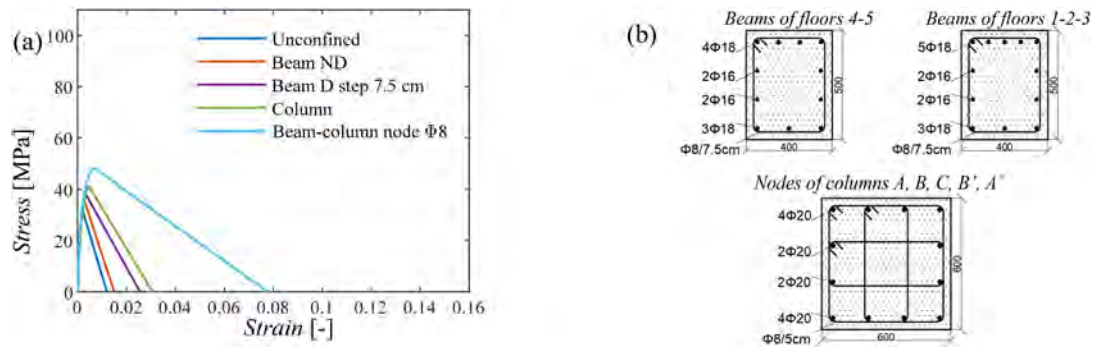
$C + springs + rebars$  model: (a) Constitutive laws of concrete in compression; (b) longitudinal and transverse reinforcement of the dissipative area of the beams in the cross-sections of Figure 3a and in the beam-column nodes.
